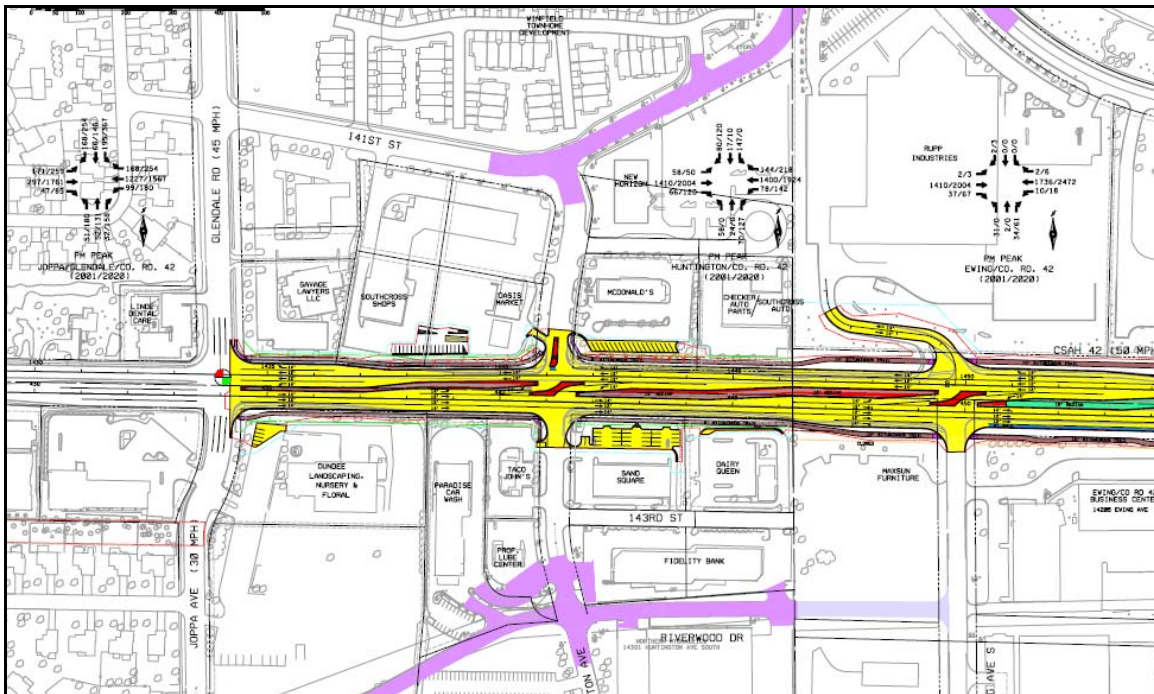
Detail from recommended design around Glendale Road and Huntington Avenue (from Dakota County, Minnesota)
